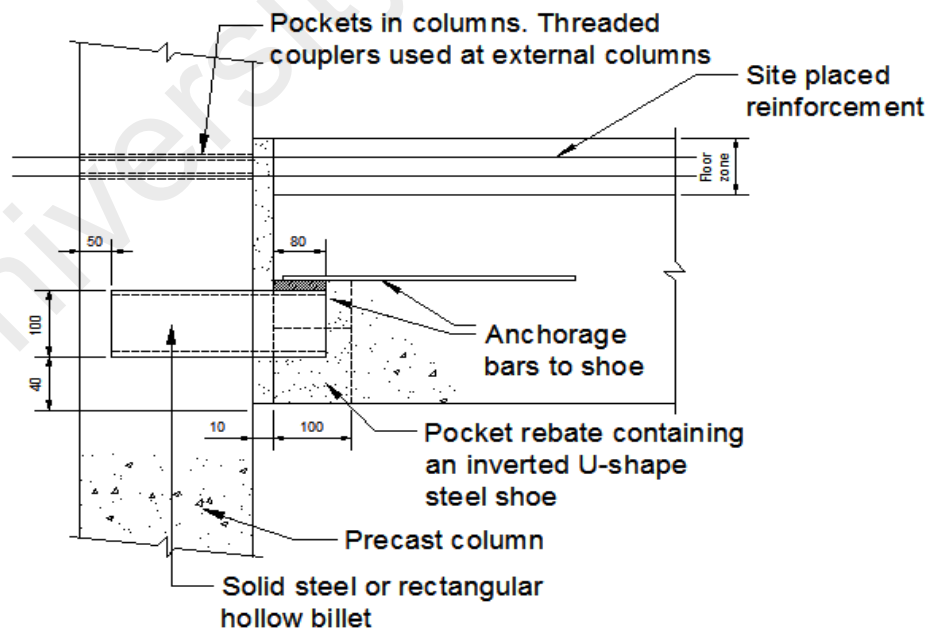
Precast beam to column connection using solid or hollow billet with top steel reinforcing bars (Elliott, 1996)
